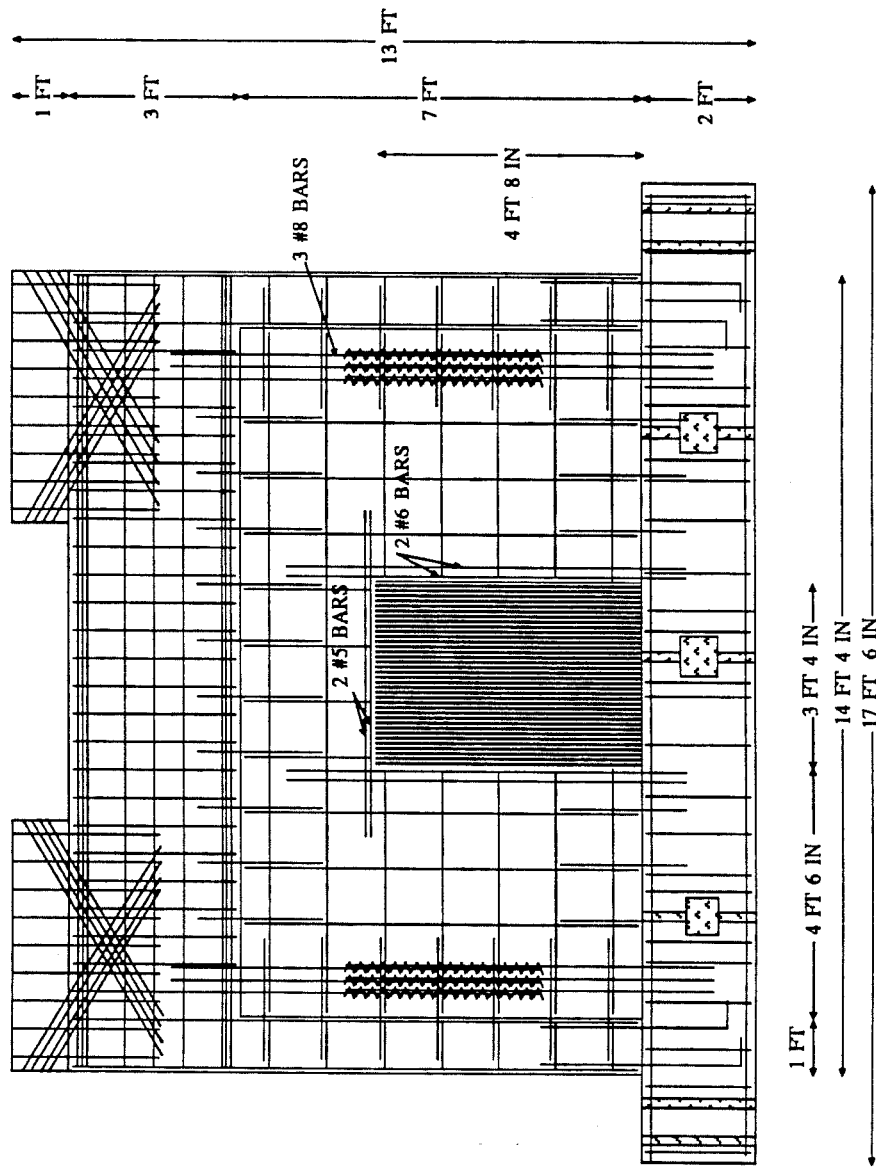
Infill with Door - Geometry and Steel Layout (from Ref. 24)
